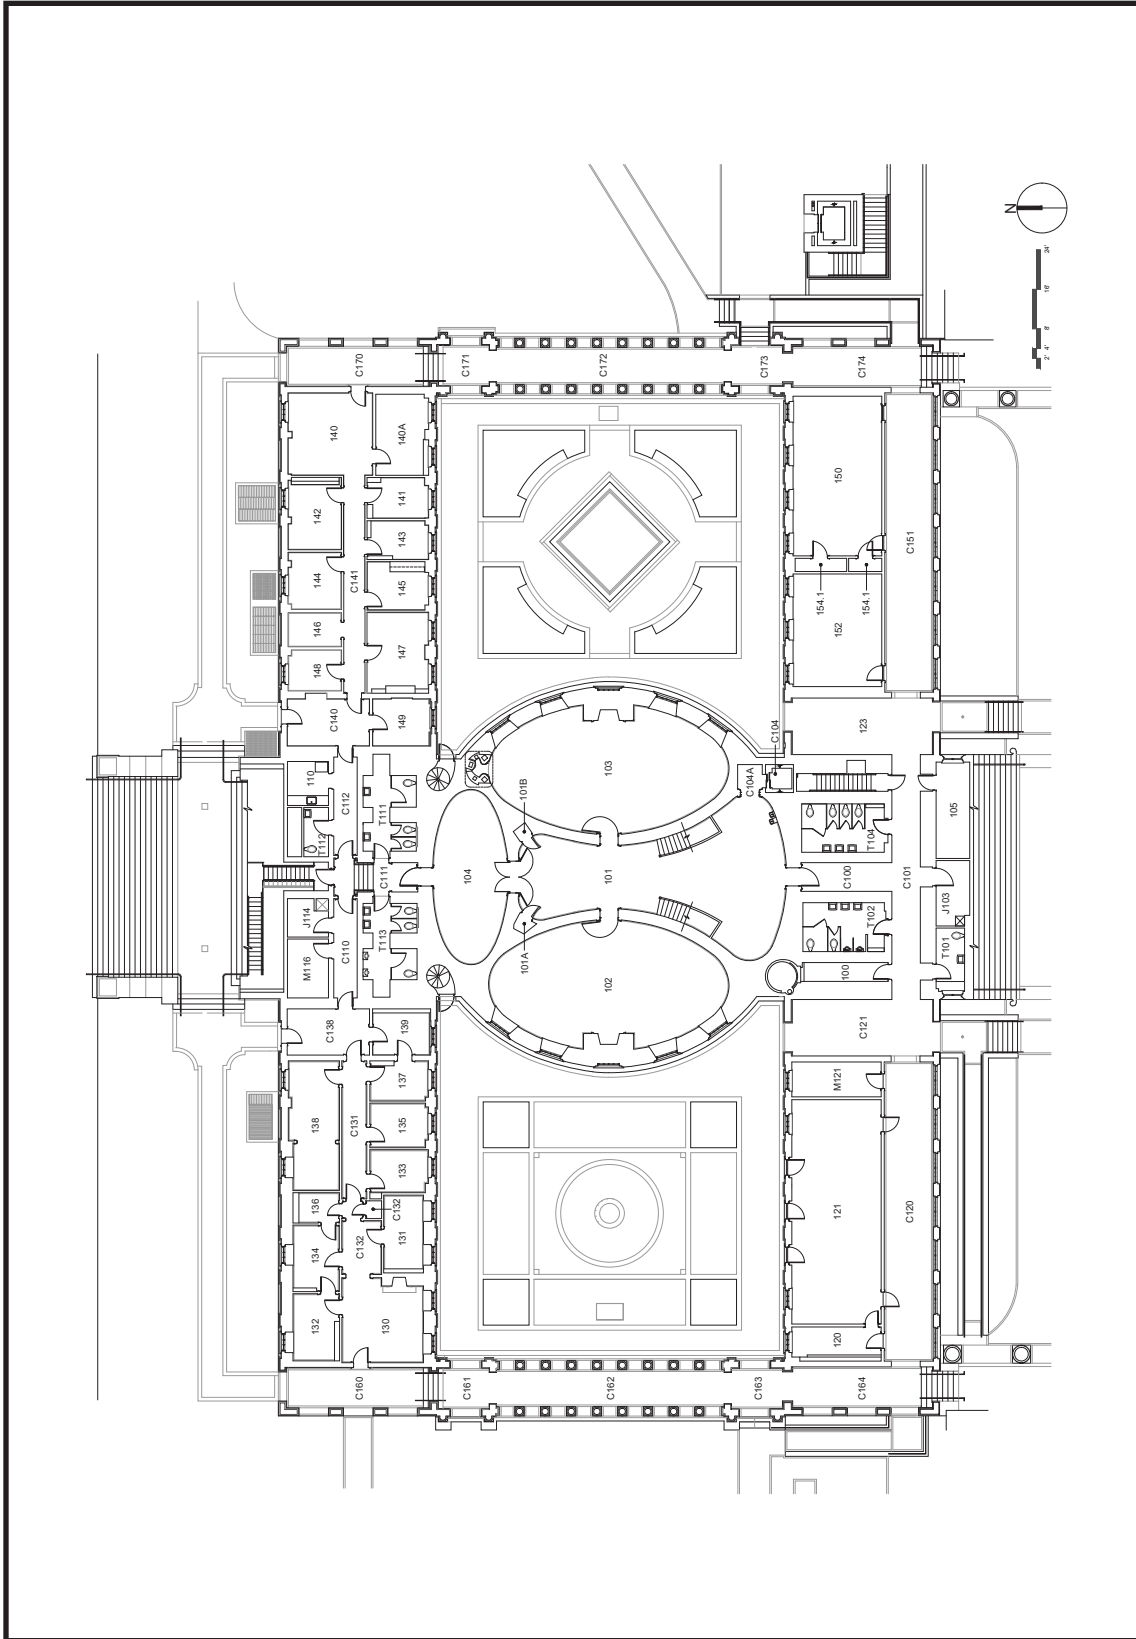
Plan of the ground floor. Drawing by John G. Waite Associates, Architects, 2022.
